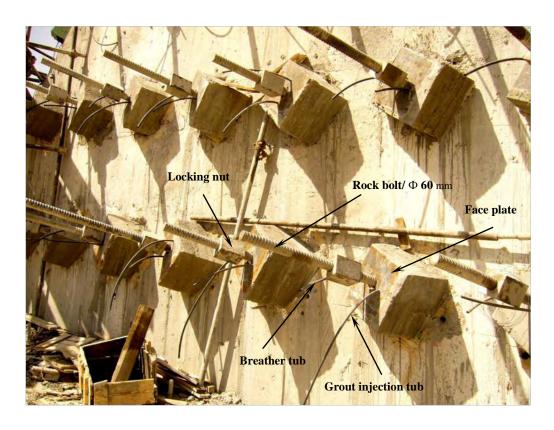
Systematic rock bolting (60 mm in diametre) of rock slope face at spillway- right flank of Karun-4 dam (2007).
